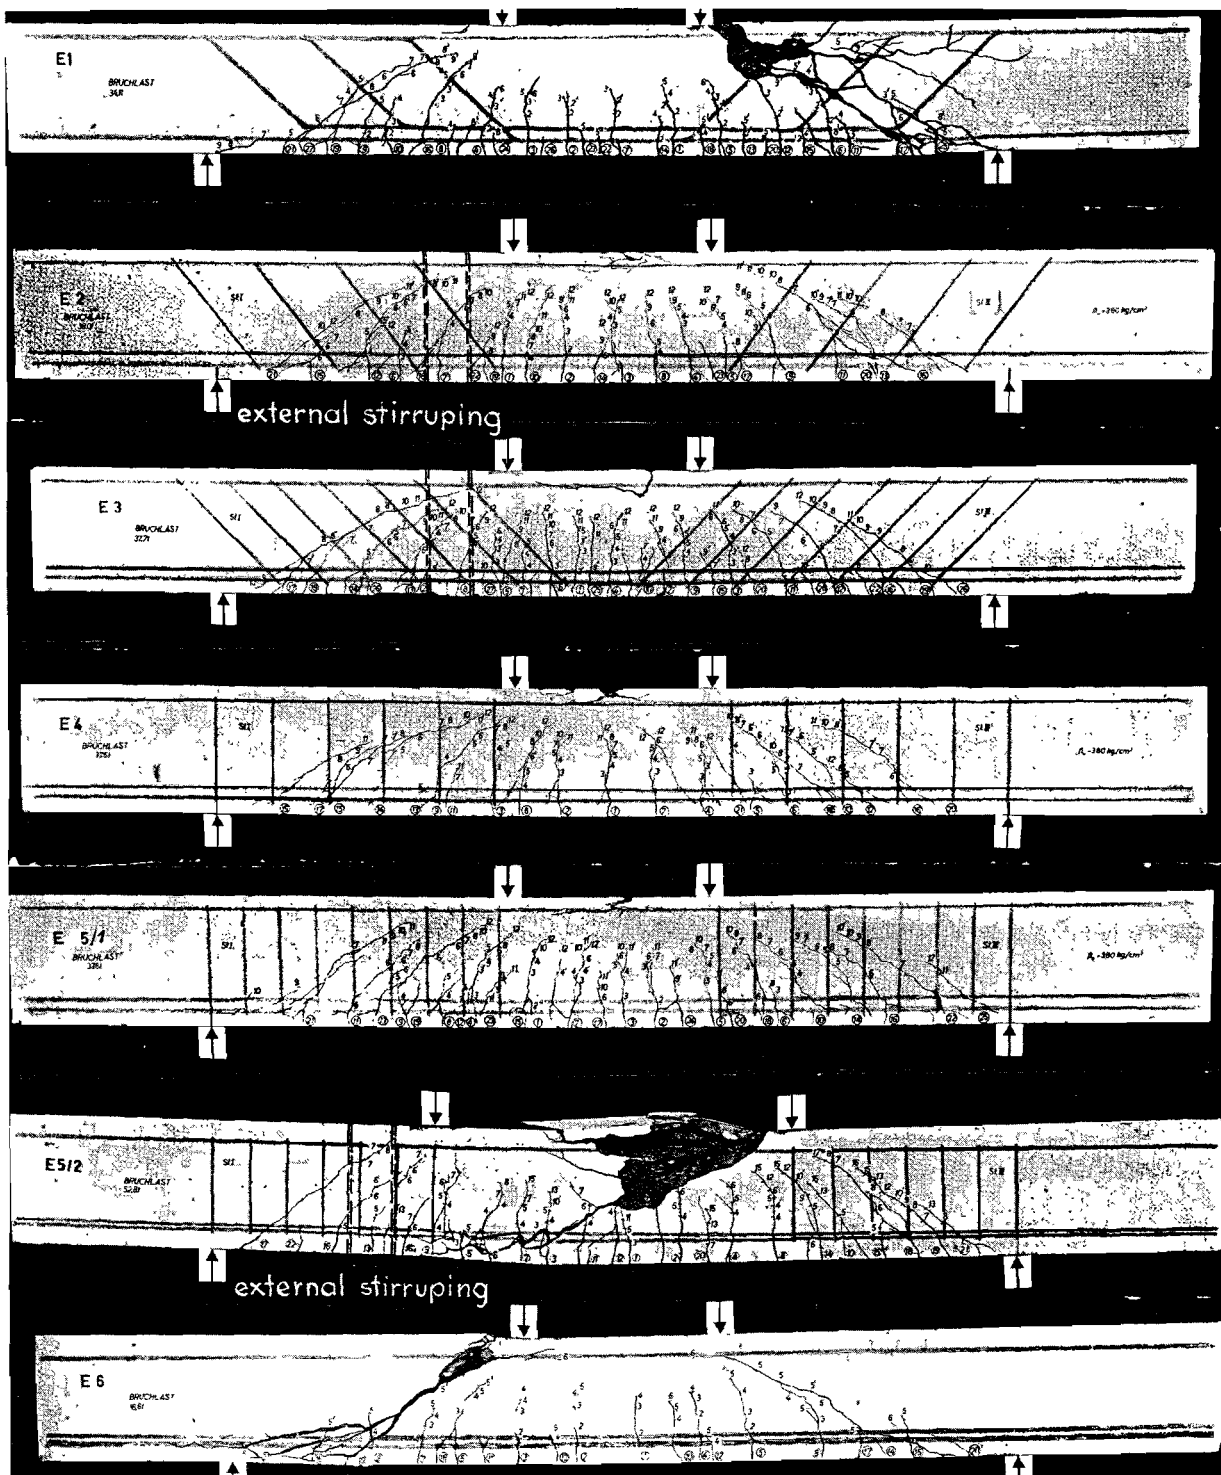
Cracking and fracture patterns of the concentrated-load beams with different shear reinforcements. (Figures in circles are serial numbers of cracks; other figures denote loading state at which a crack penetrated up to the point indicated: loading stage $P = 3.1$ tons.)
